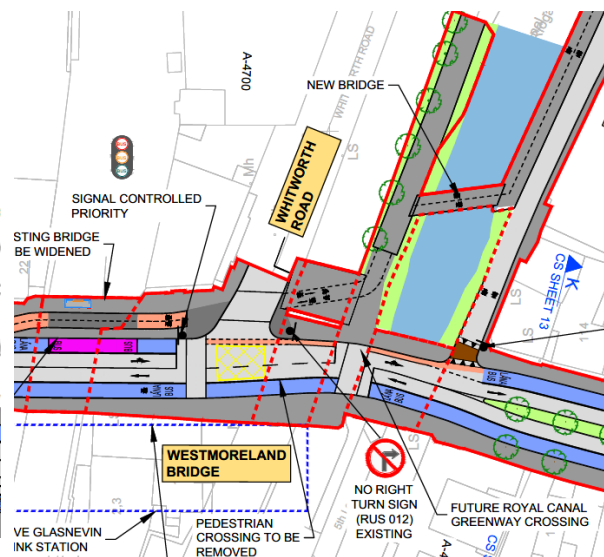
Proposed Scheme arrangement over Cross Guns Bridge Option B
